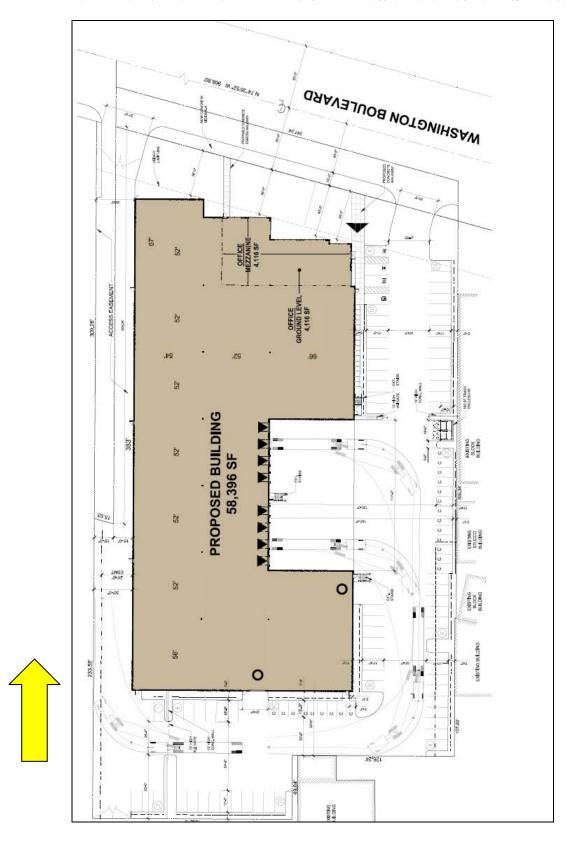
CONCEPTUAL SITE PLAN SOURCE: WARE MALCOMB
